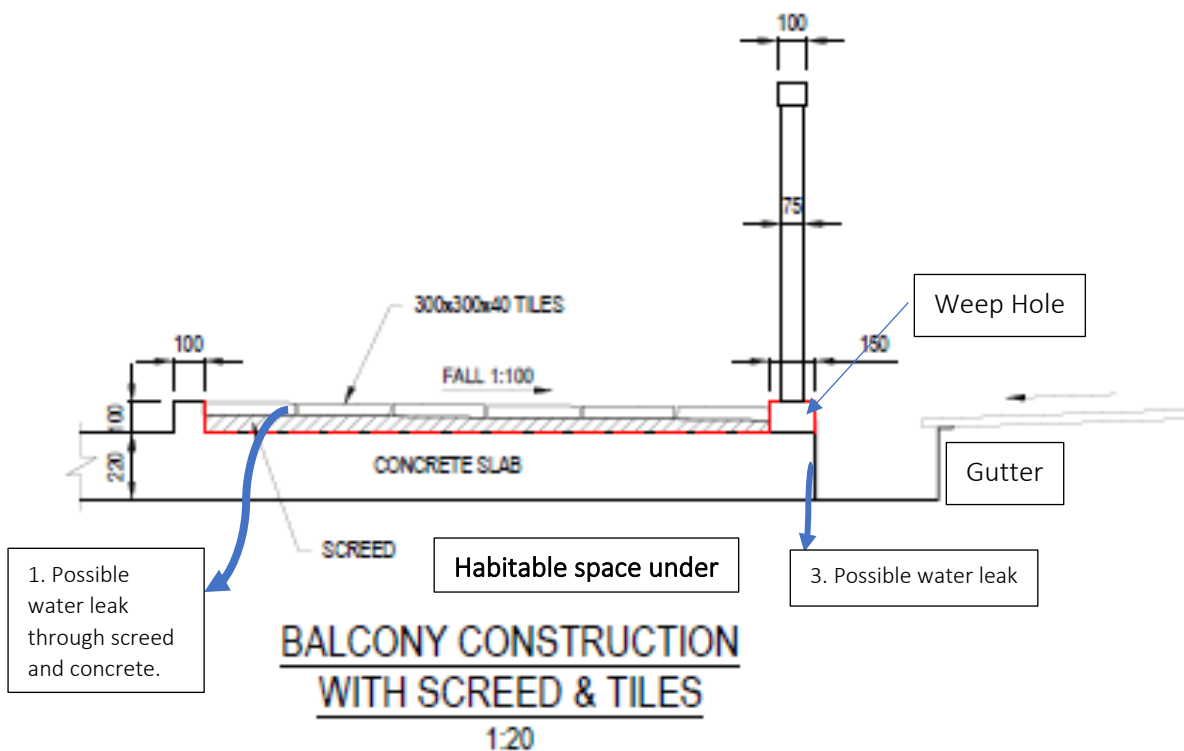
Original details - construction screed and tiles (CI's interpretation)
